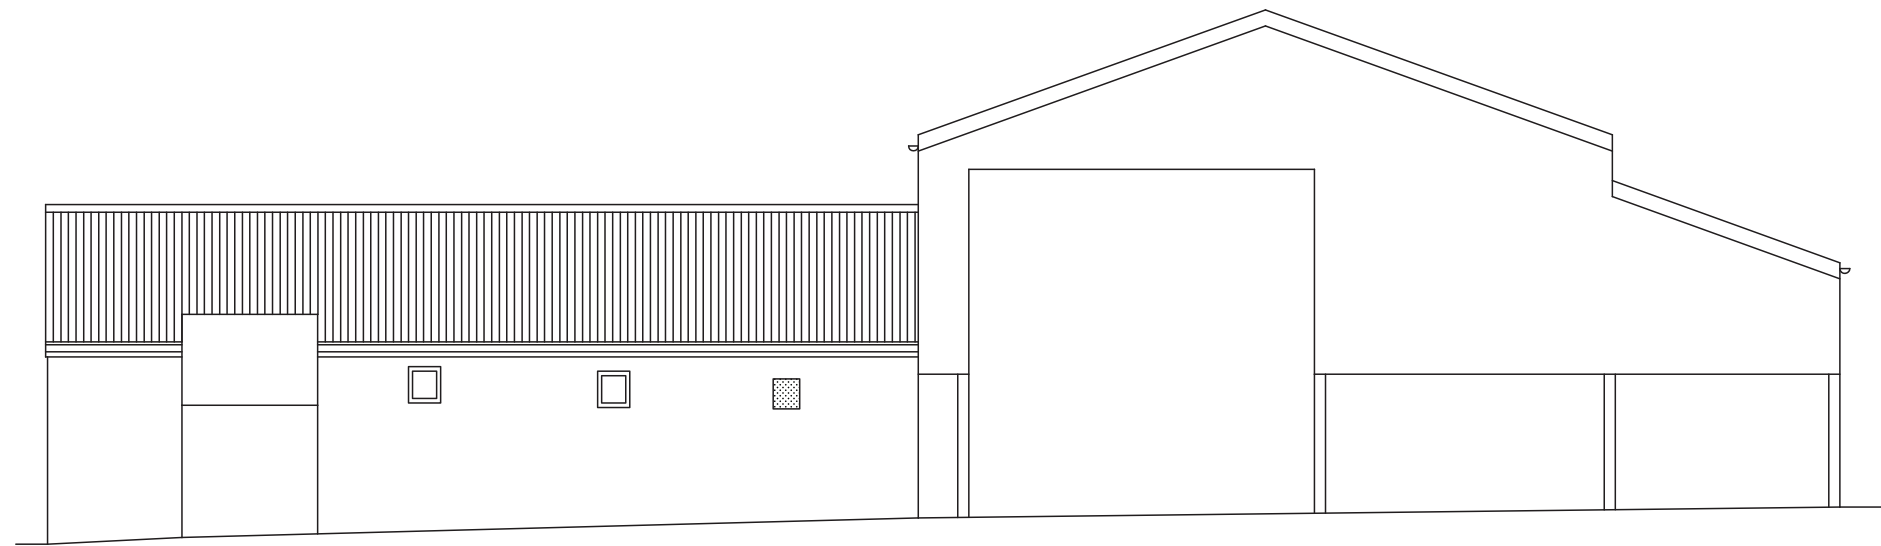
The north-west end of the south-west external elevation, viewed from the south-west
